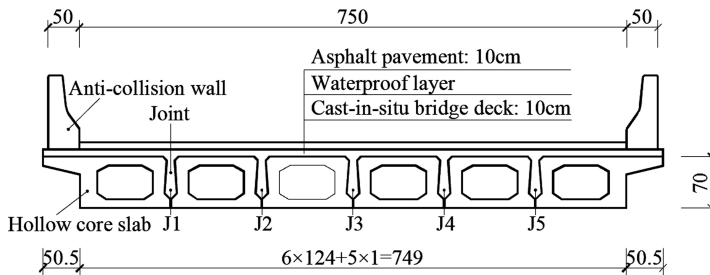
Cross section of hollow-core slab bridge (Unit: cm)
